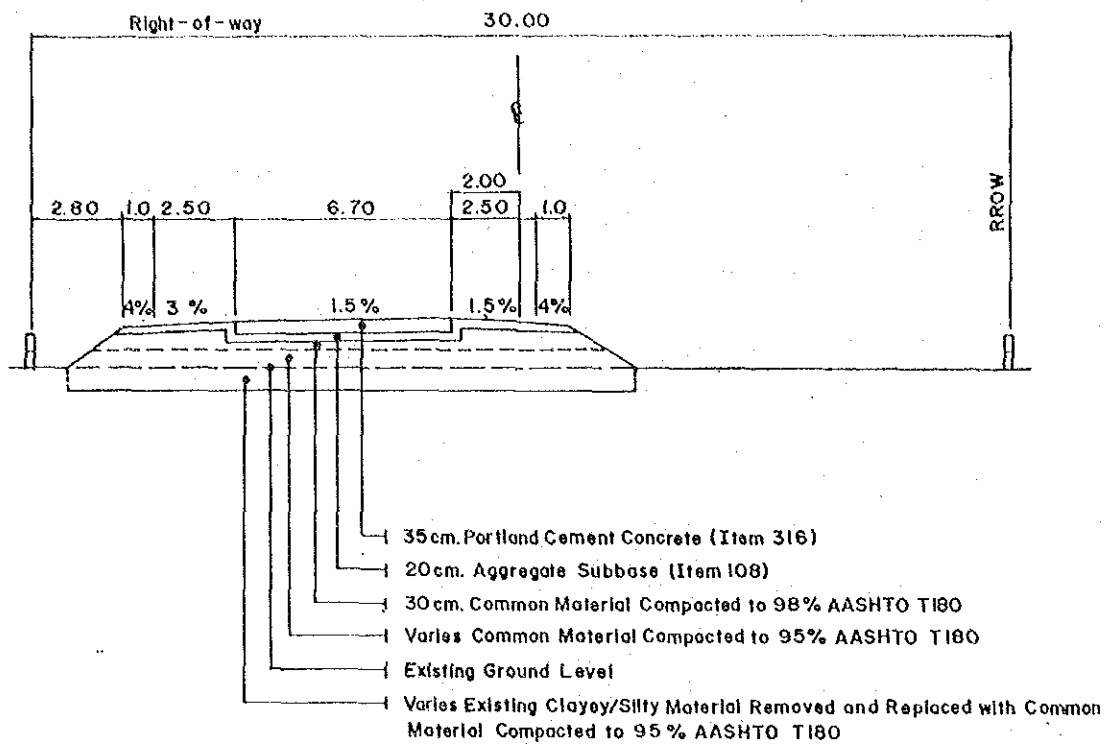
TYPICAL SECTION PLARIDEL BYPASS
